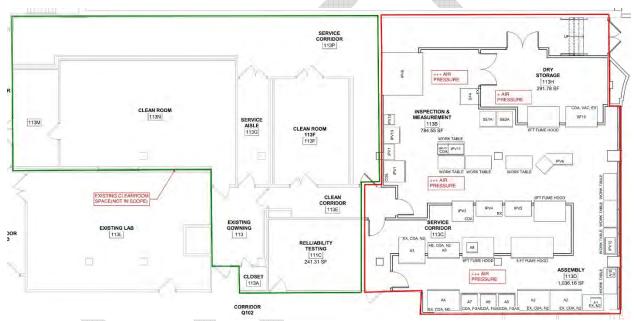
Cleanroom Pressurization Plan -Hybrid EEW
